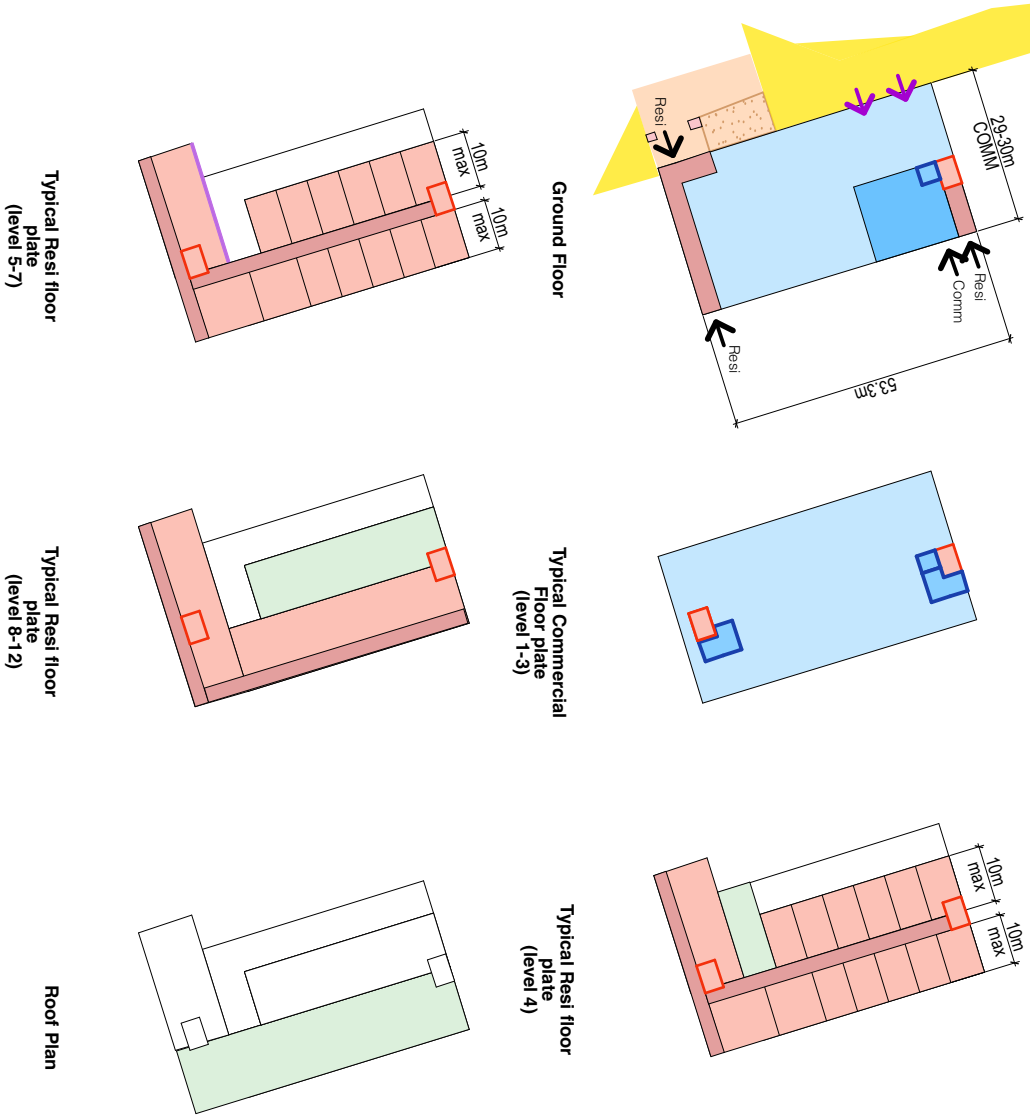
Proposed Site Specific Controls - Waterloo Metro Quarter - Affordable Housing - possible floor plan arrangements
